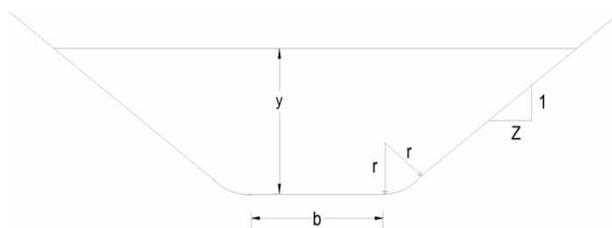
| Definition sketch for the curved corner trapezoidal canal section.
